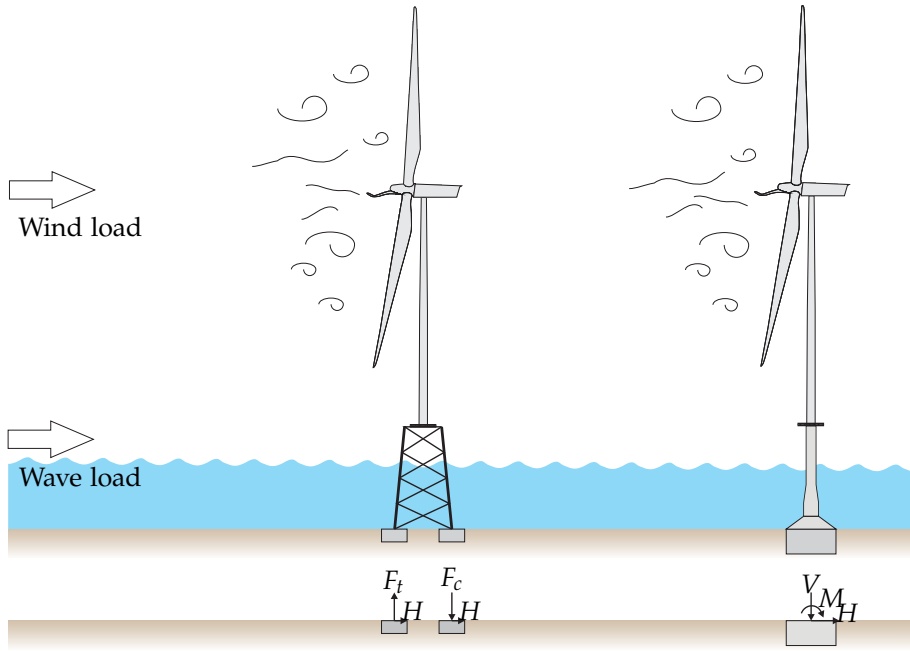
Wind and wave loading on a bucket supported jacket structure (left) and a mono bucket foundation (right). The loads on the foundations are illustrated at the bottom part. V and H are vertical and horizontal loads and M is a moment. F_t and F_c are tension and compression forces. Only large overturning moments will trigger tension forces. For small overturning moments, the self-weight of the structure may be dominant creating only compression forces.
